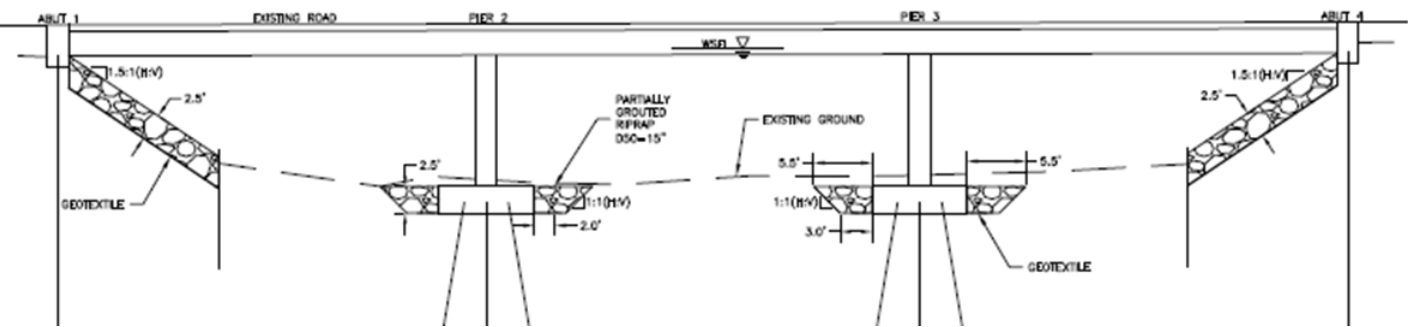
Cross-sectional view of Bridge G-26-B with recommended hydraulic scour countermeasures
